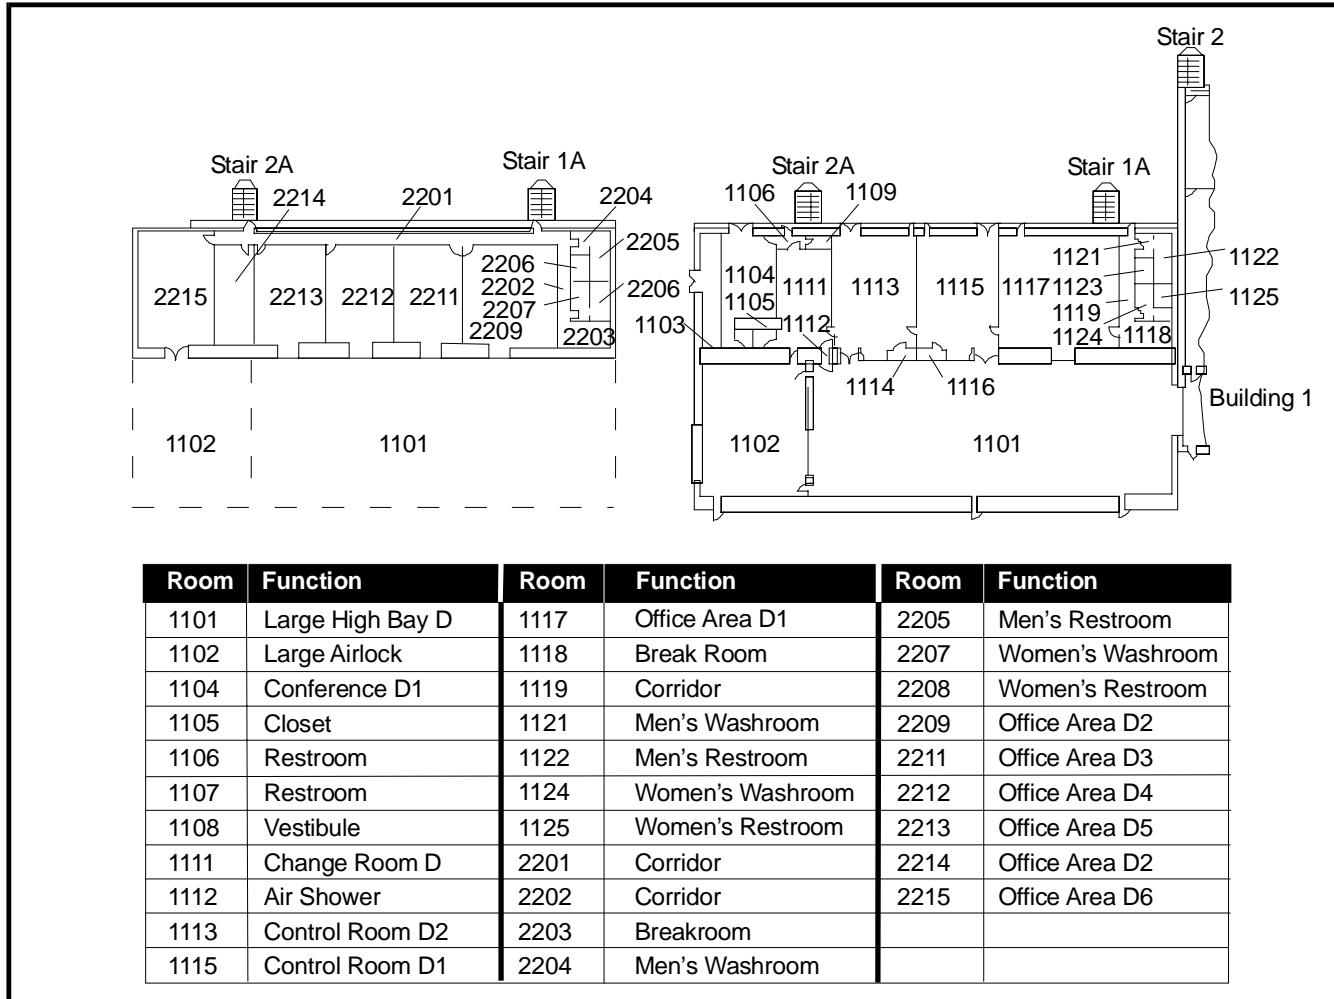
Astrotech Building 1 Large Bay Detailed Floor Plan—First Floor
